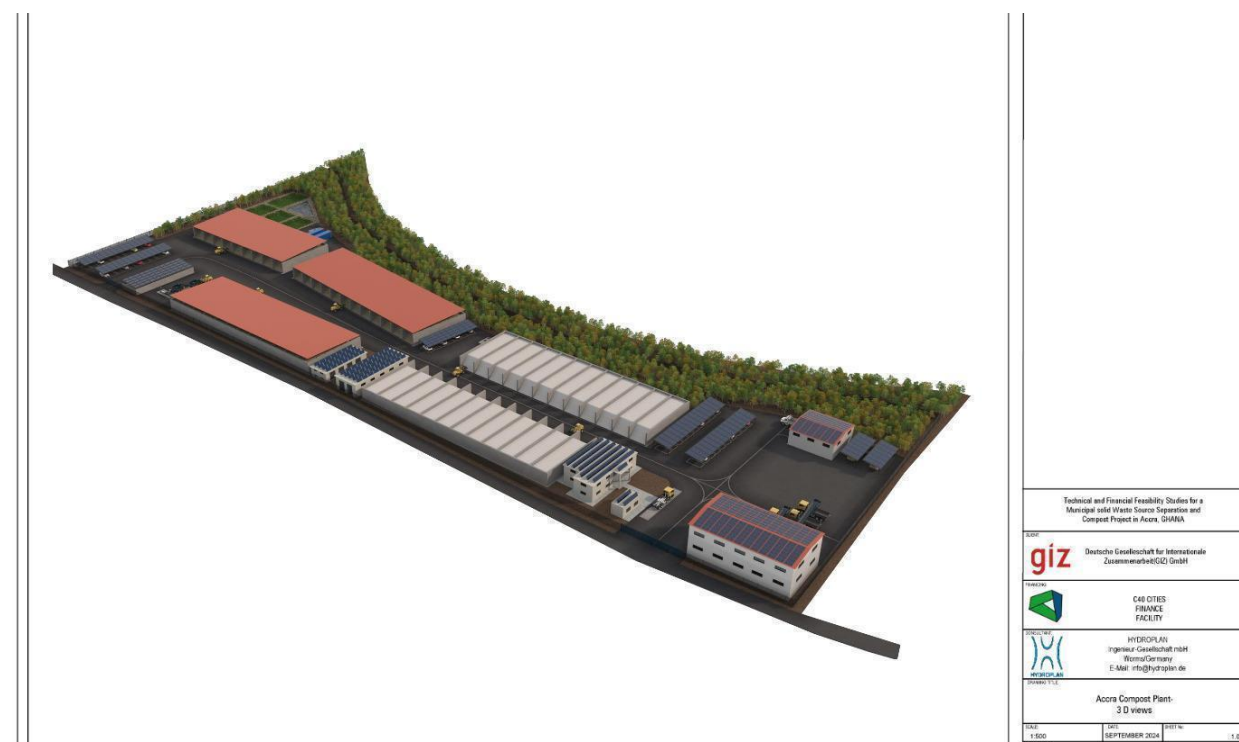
4 3D View of Proposed Compost Plant Facility. (Source: GIZ/HYDROPLAN (2024))
